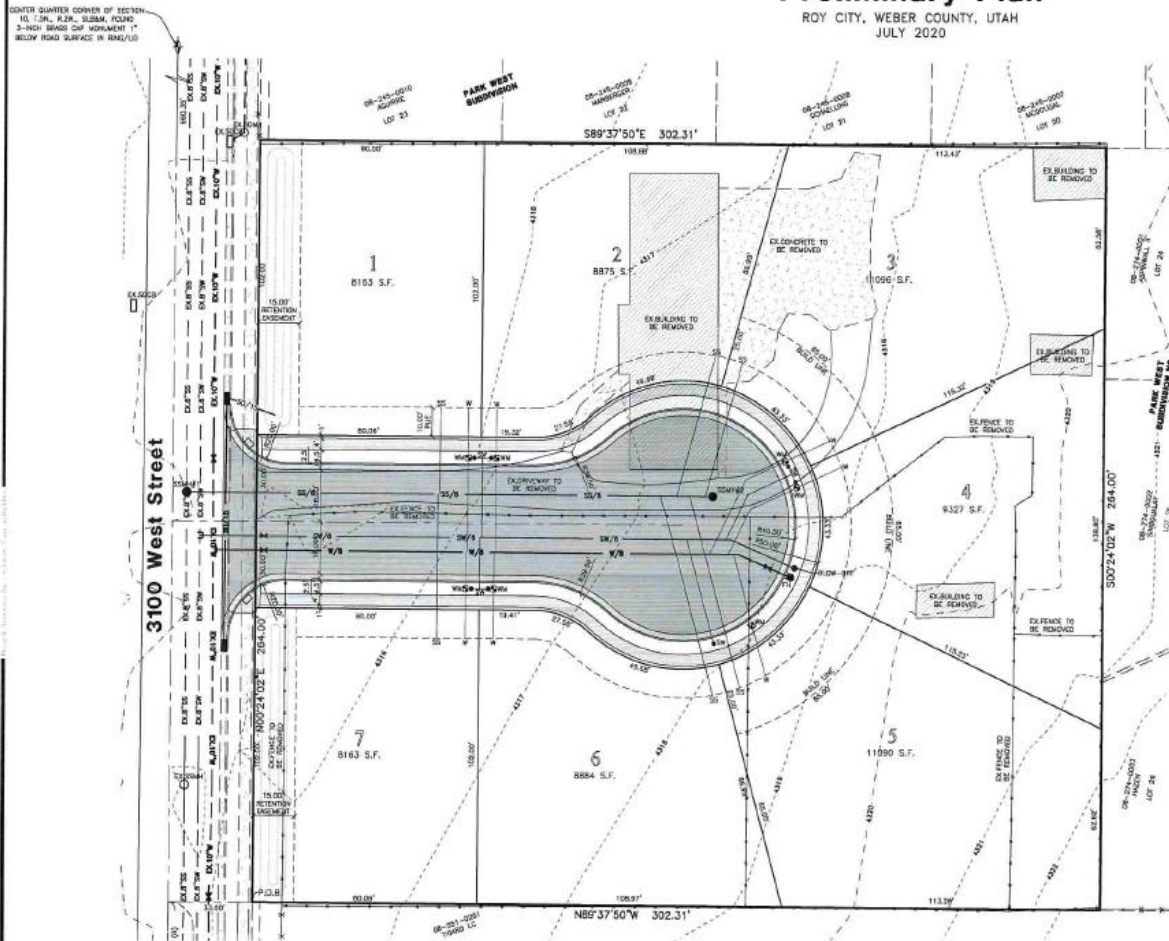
## EXHIBIT "B" – PROPOSED SUBDIVISION PLAT
